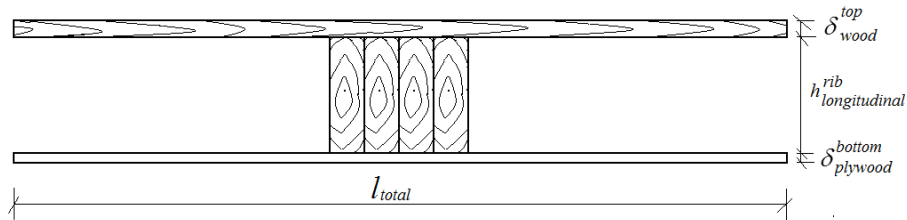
Schematic diagram of a lightweight wooden roofing slab with I-beam.
